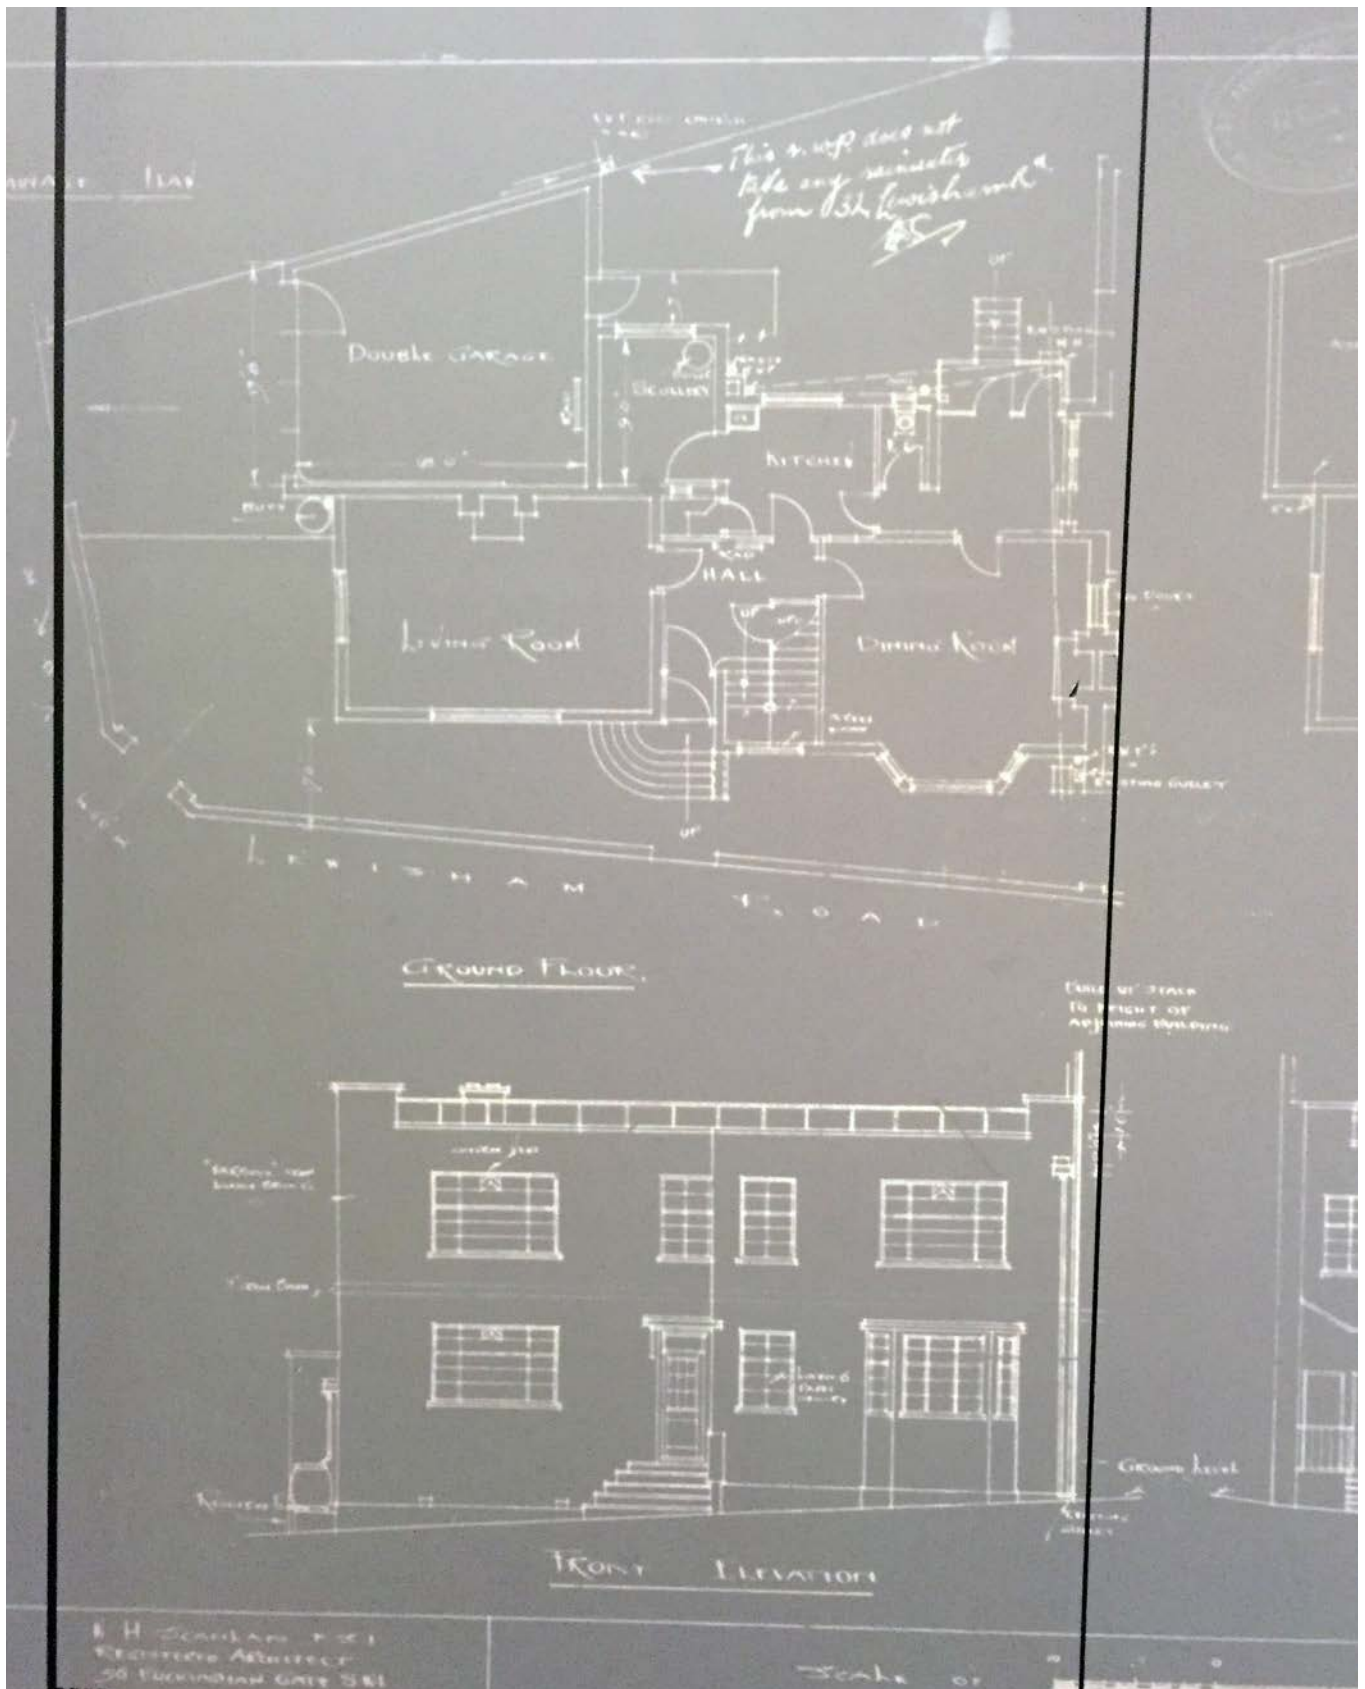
Extension to the extension_ 1931 (Camden Archives)
